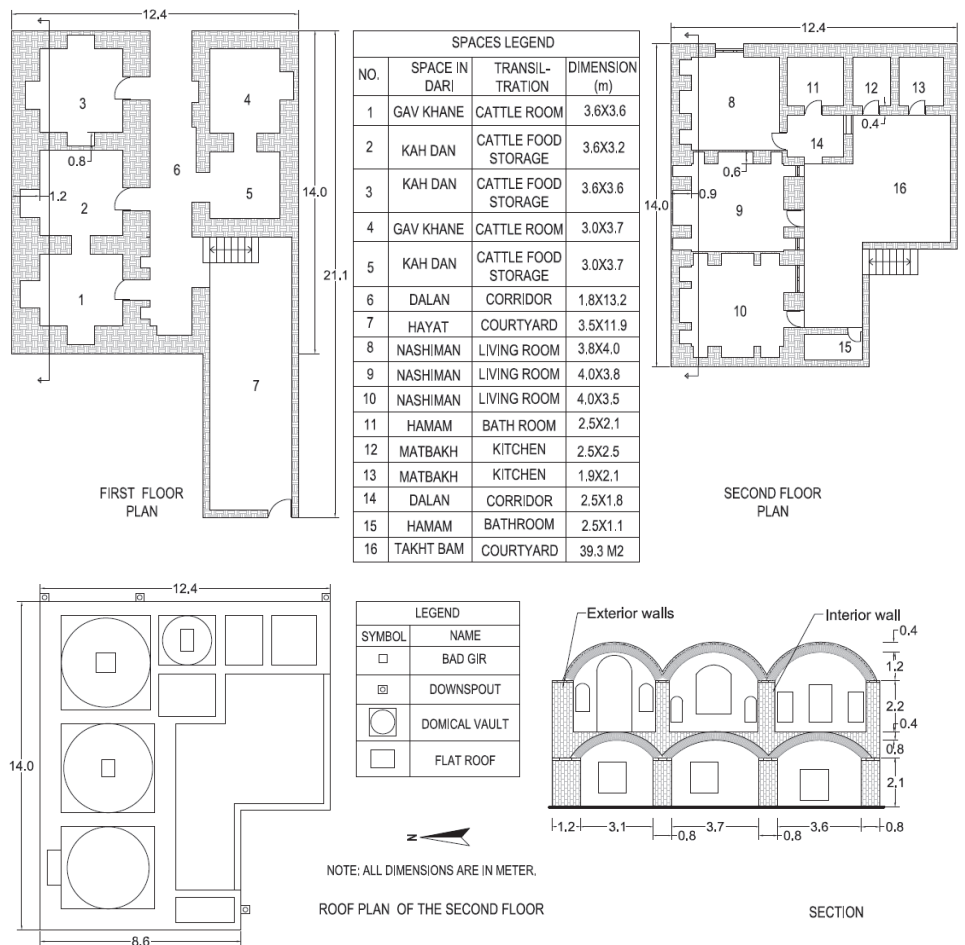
First floor plan, second floor plan, roof plan and section of Faqir house (Drawing by K. Kawish 2016)
